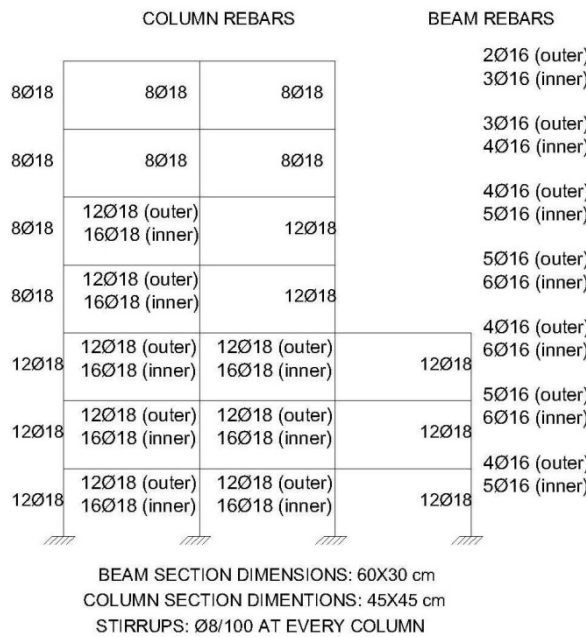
Section dimensions and detailing of the Seven-Storey Tower Frame B.
